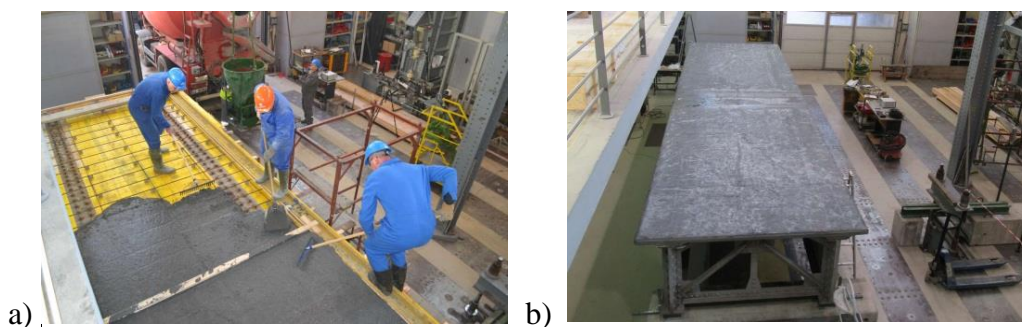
Placing of concrete (a) and the bridge with the slab (b)
